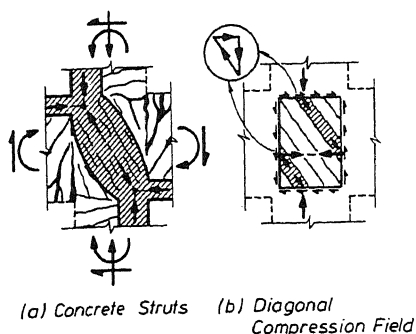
Mechanisms of Shear Transfer at an Interior Beam-Column Joint of a Plane Frame.
